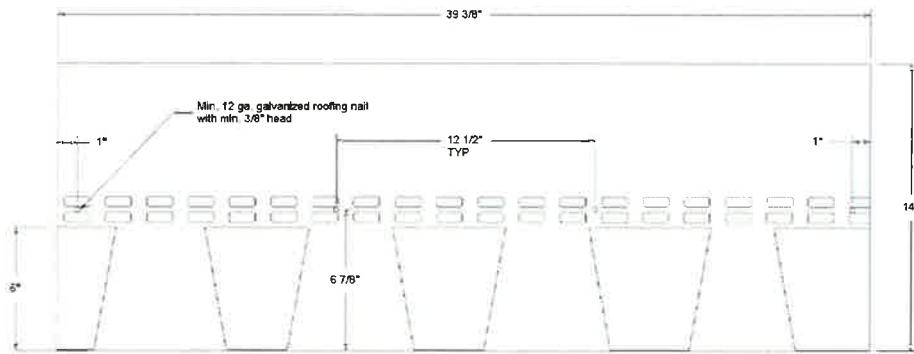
Pinnacle® Pristine and StormMaster® Shake 4 Nail Pattern (Non-HVHZ only)
